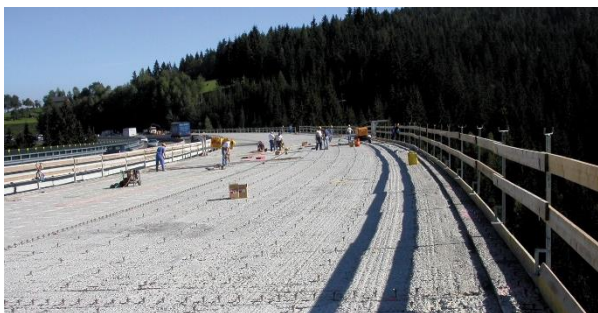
Reinforcement of a bridge deck with Hilti HCC-B connectors
